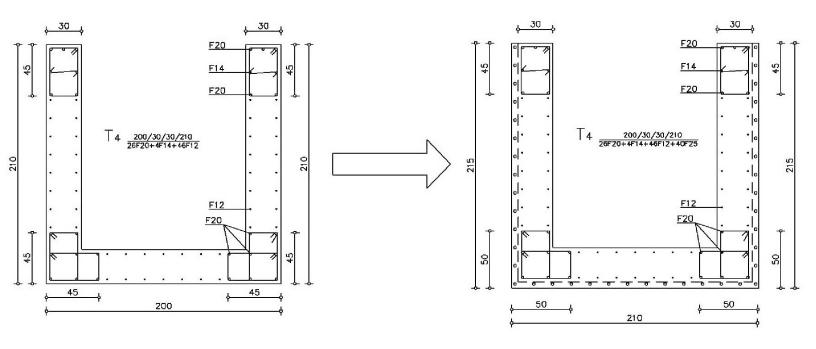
T4 Column Cross Section Area-Before and After the Strengthening
